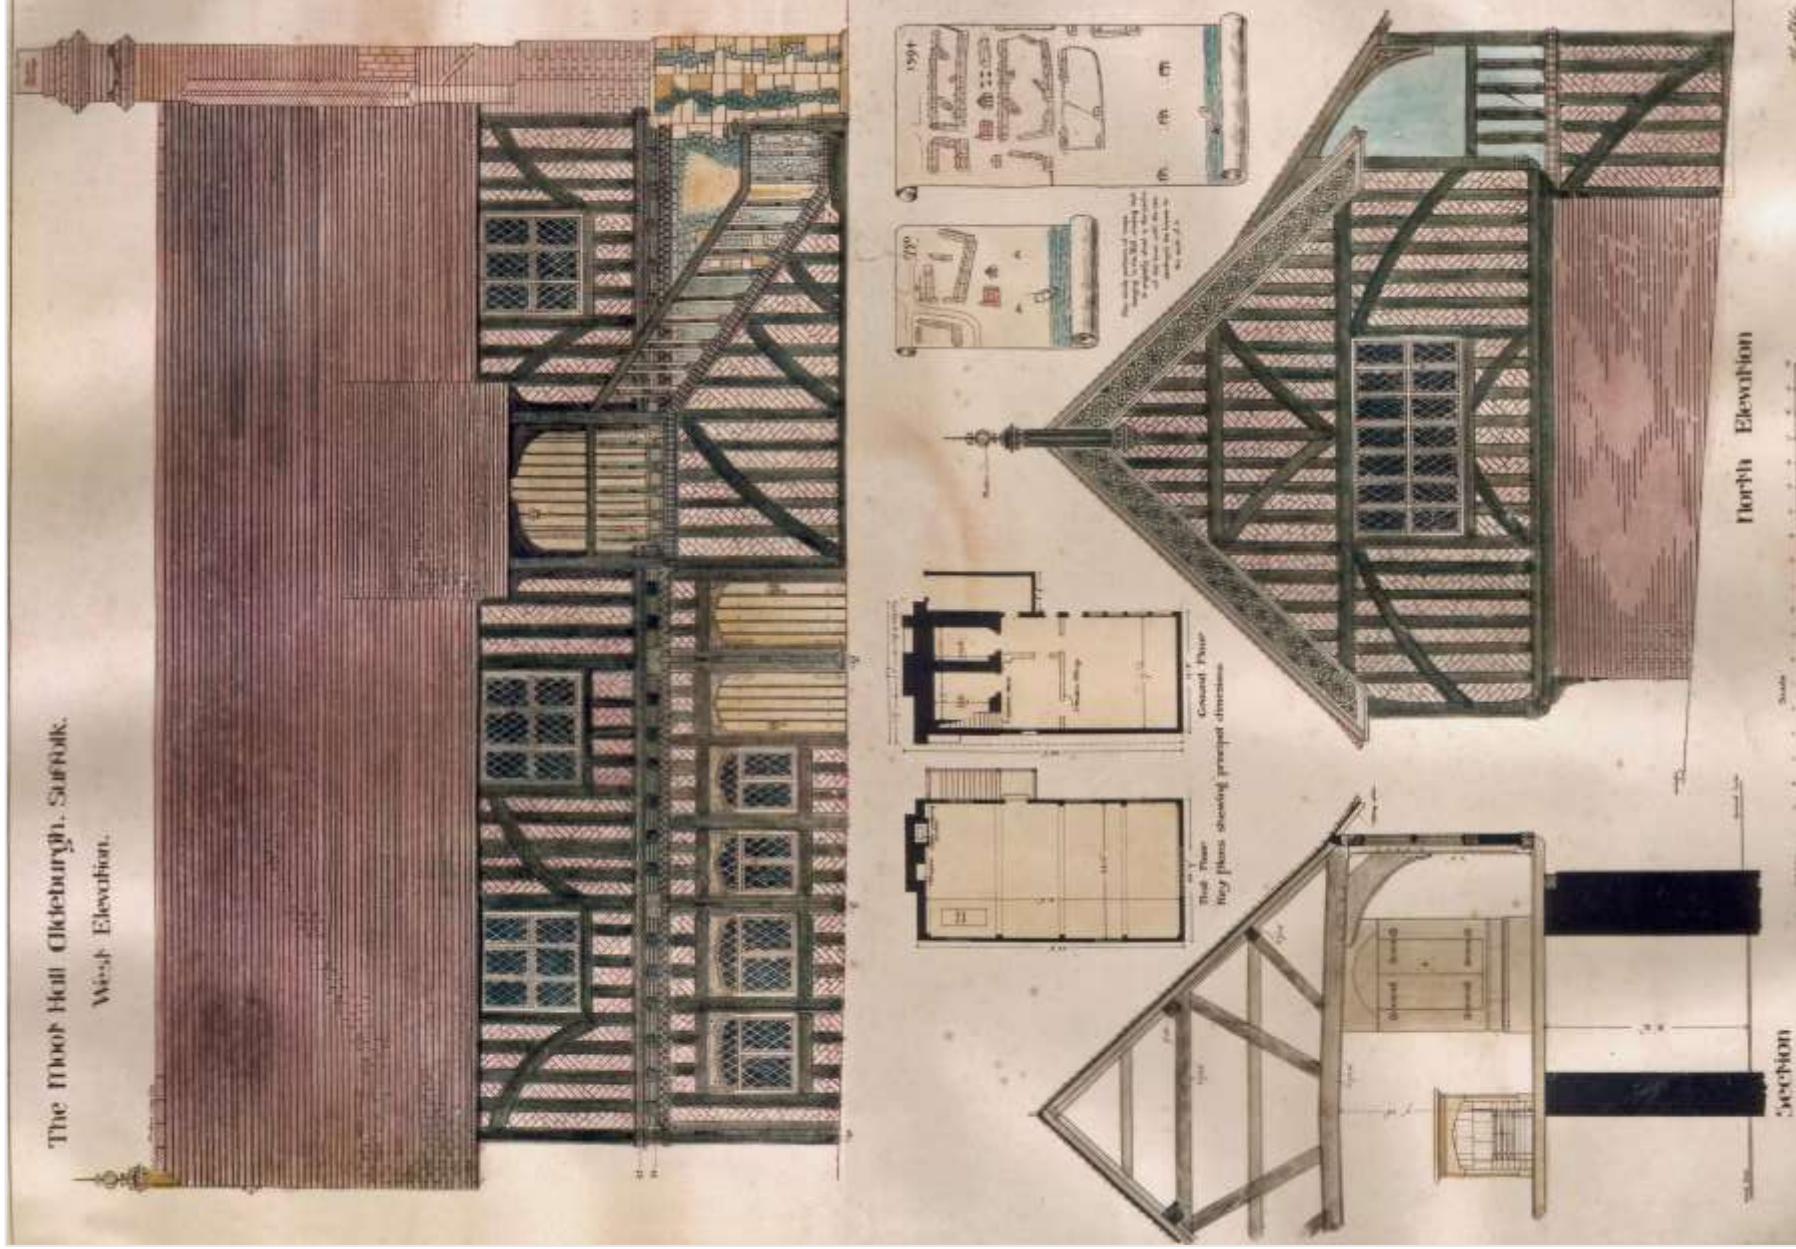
Plan of ground floor and first floors of Moot Hall: W & N elevations and extracts from maps of 1594 & 1790 by Thomas E. Key for Aldeburgh Borough Council in 1974.
